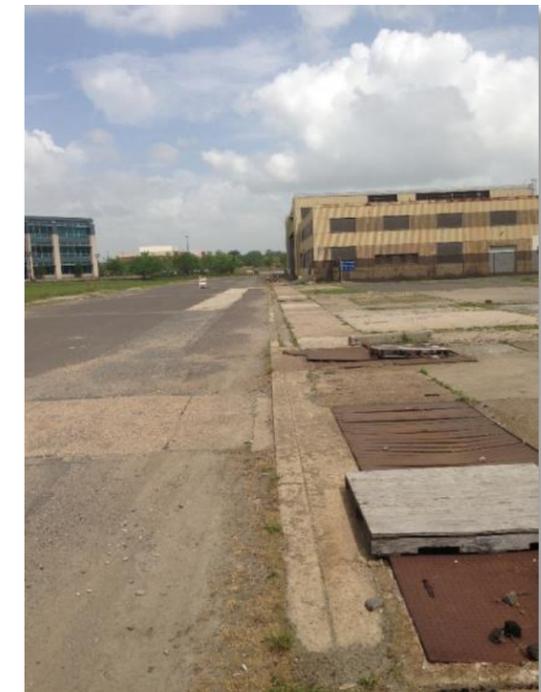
PHOTOS OF PROJECT SITE & IMMEDIATE AREA
